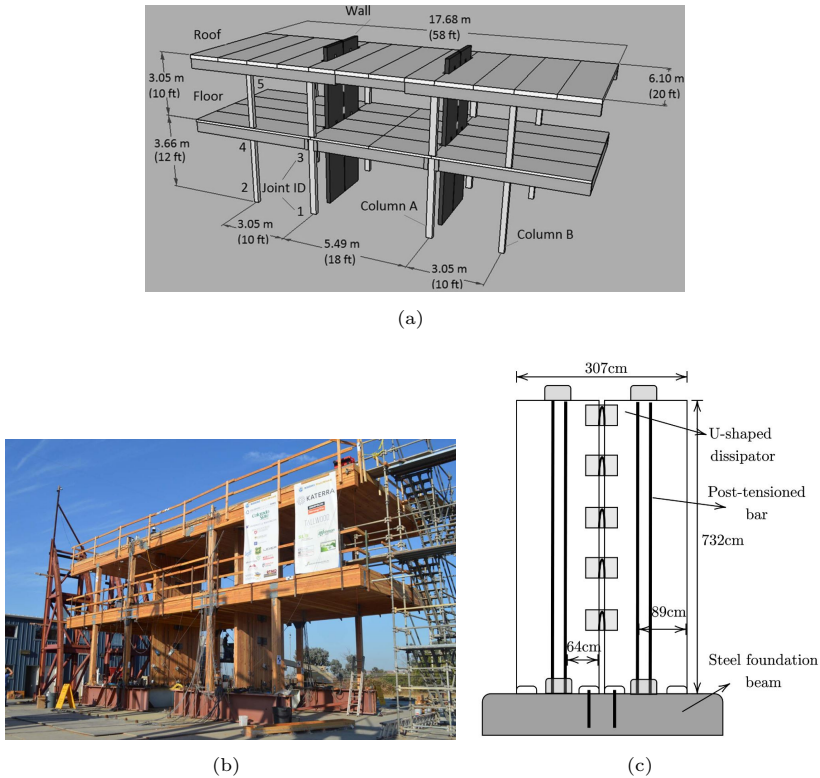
Test building configuration: (a) solid model and dimensions; (b) photo of the constructed building and (c) schematic drawing of the rocking CLT wall.
